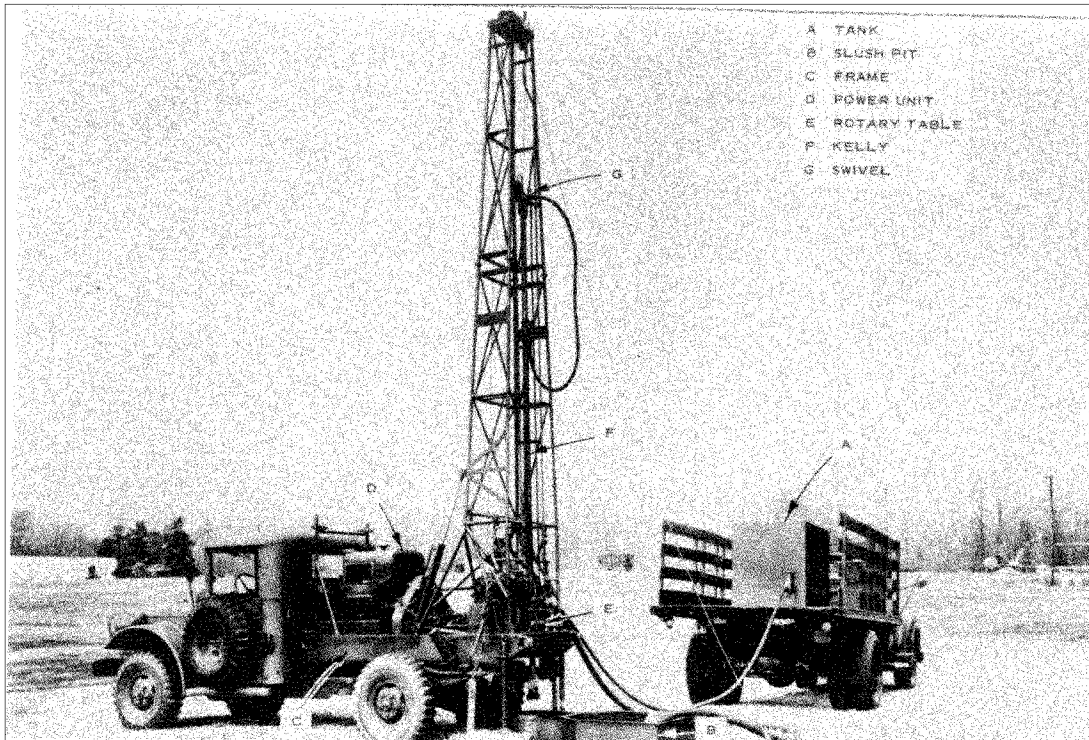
Truck-mounted rotary drill rig with a chain feed drive system
